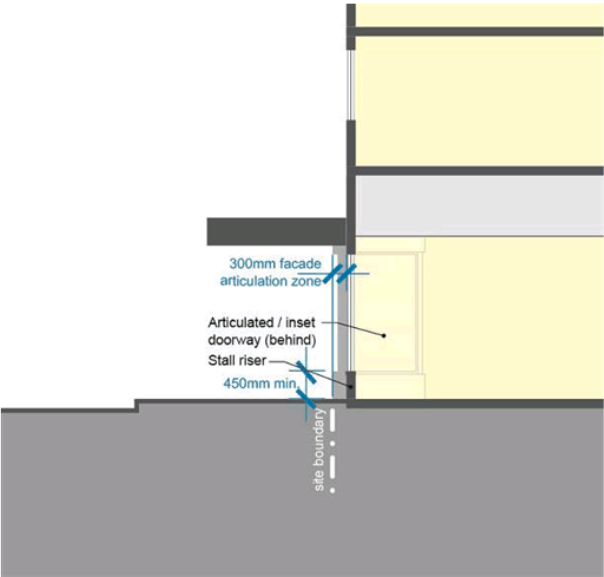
, C1.3.9, C1.3.10 & C1.3.11 – Façade Design
